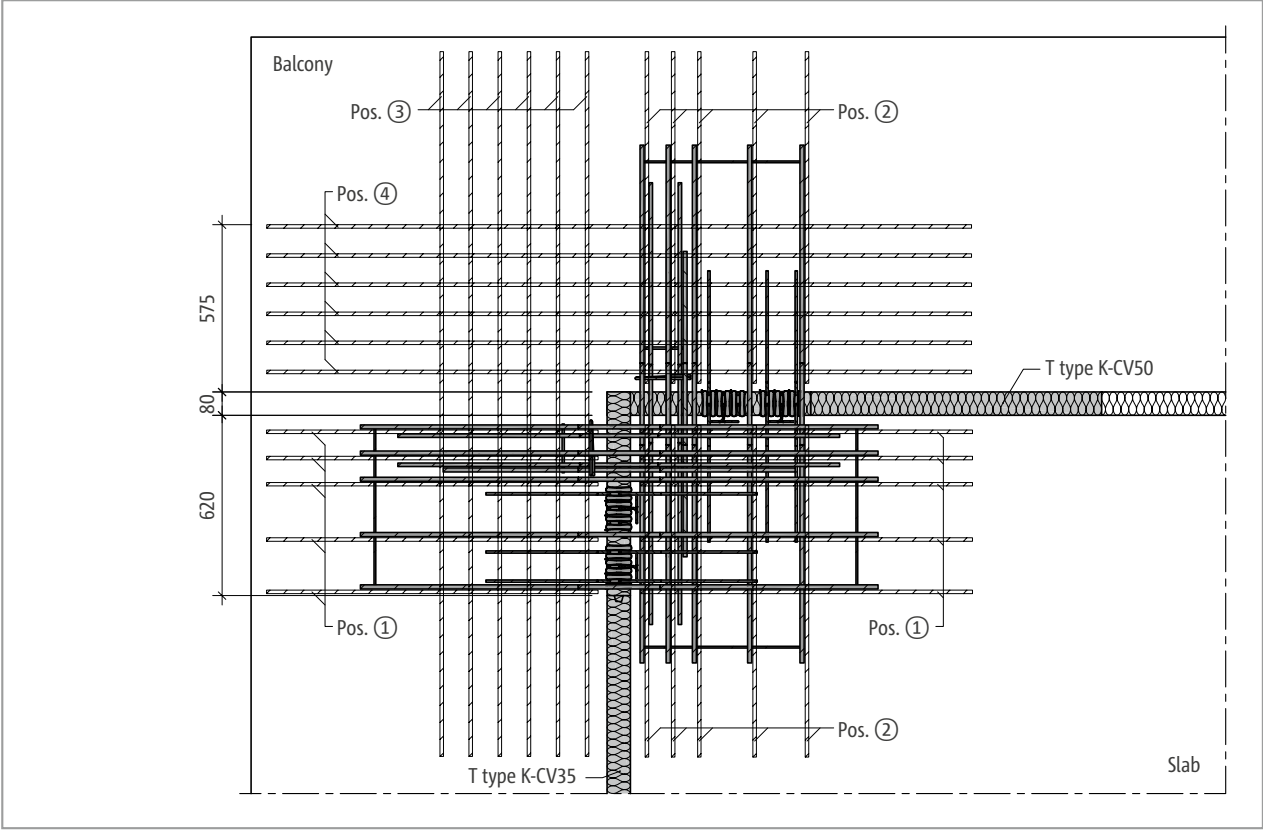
Schöck Isokorb® T type C-M2: On-site reinforcement (top position)
